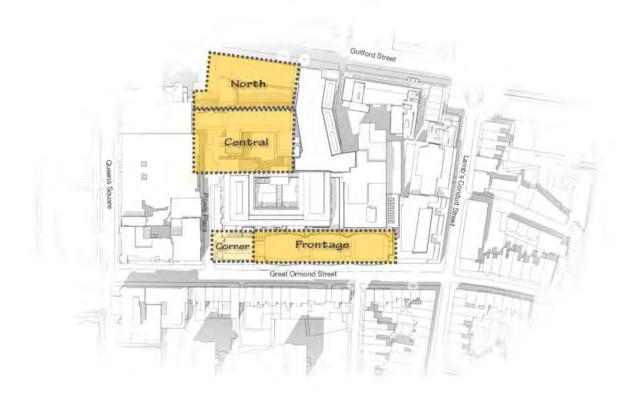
Site Plan showing areas for potential future redevelopment identified as the Frontage and Corner Buildings as Phase 4 and Southwood and Nurses Building as Phases 5A (Central) and 5B (North)
